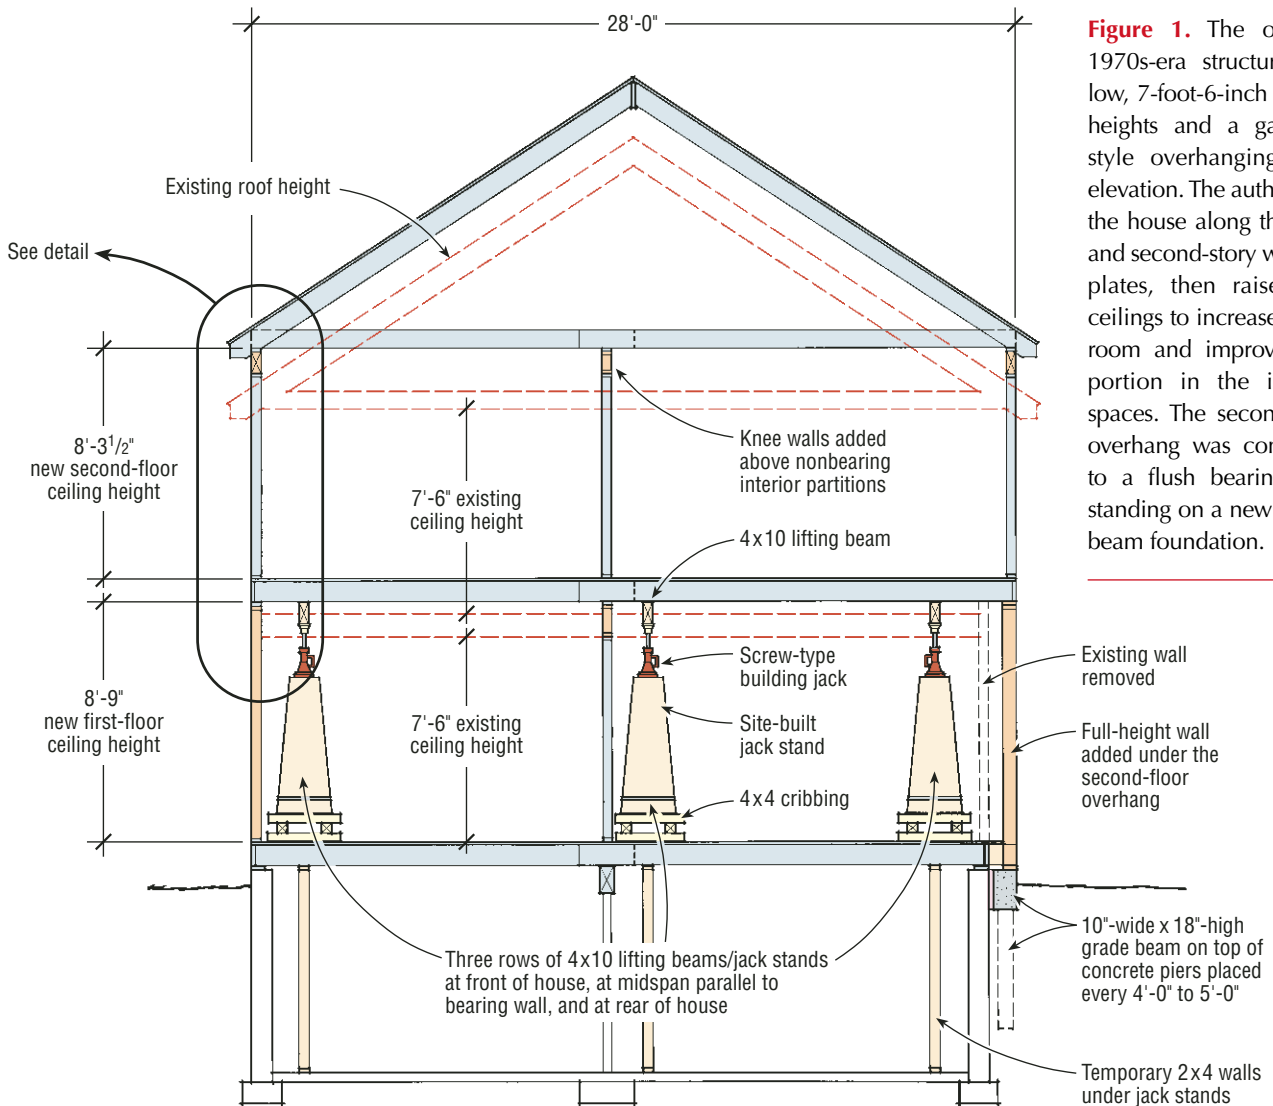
The original 1970s-era structure had low, 7-foot-6-inch ceiling heights and a garrison-style overhanging front elevation. The author split the house along the first- and second-story wall top plates, then raised the ceilings to increase head-room and improve proportion in the interior spaces. The second-floor overhang was converted to a flush bearing wall standing on a new grade-beam foundation.
